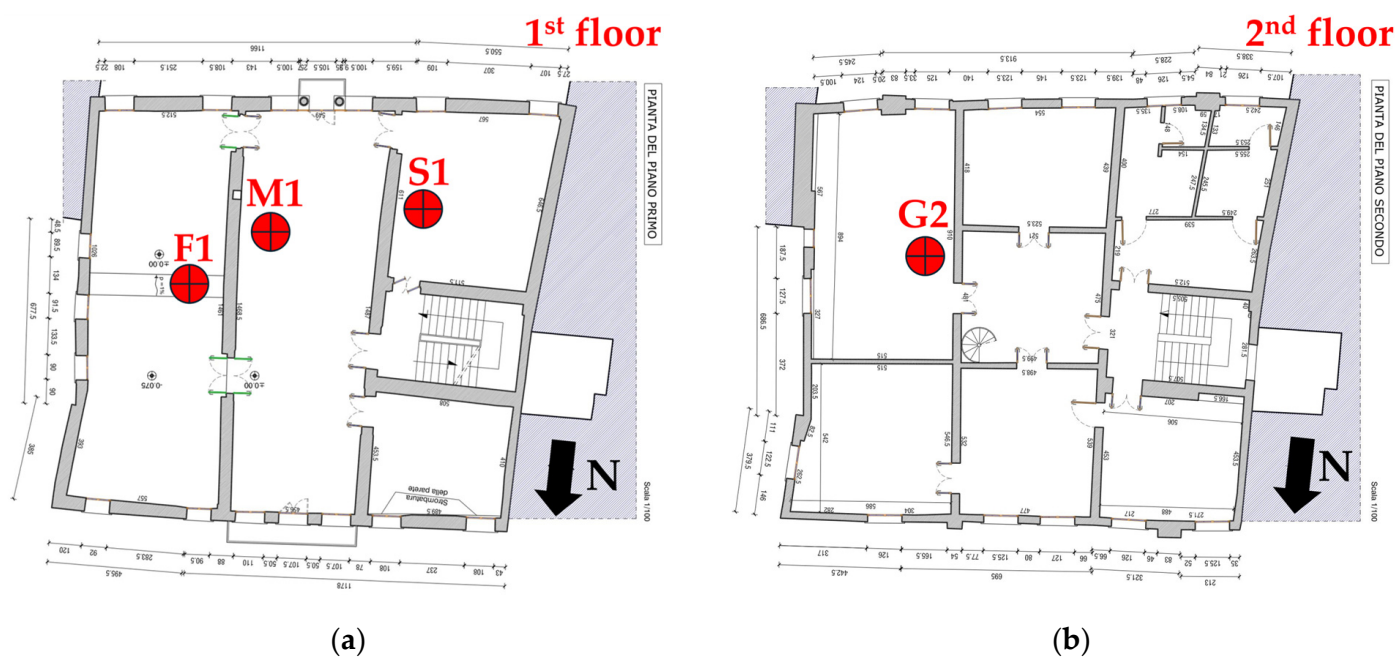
Layouts of the building: (a) first-floor plan, (b) second-floor plan. The rooms of interest are marked with codes corresponding to those listed in Table 2. Red markers indicate the monitored positions, placed at heights between 1.5 and 2 m above the floor level.
